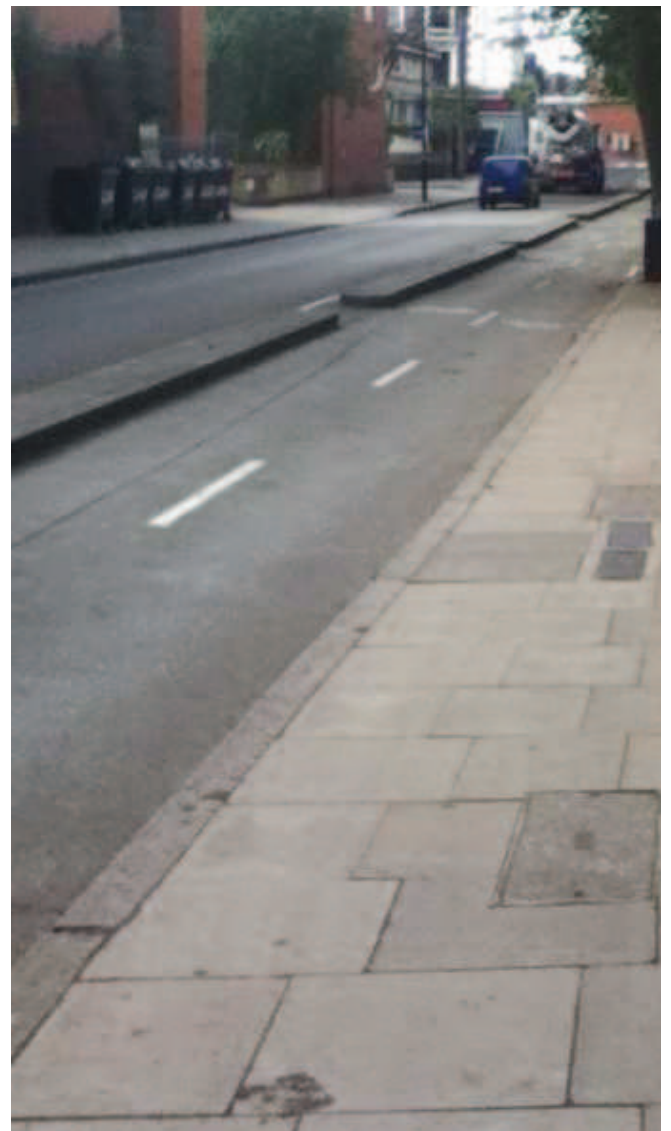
St Pancras Way Looking South, Showing Separated Contraflow Cycle Lane.
